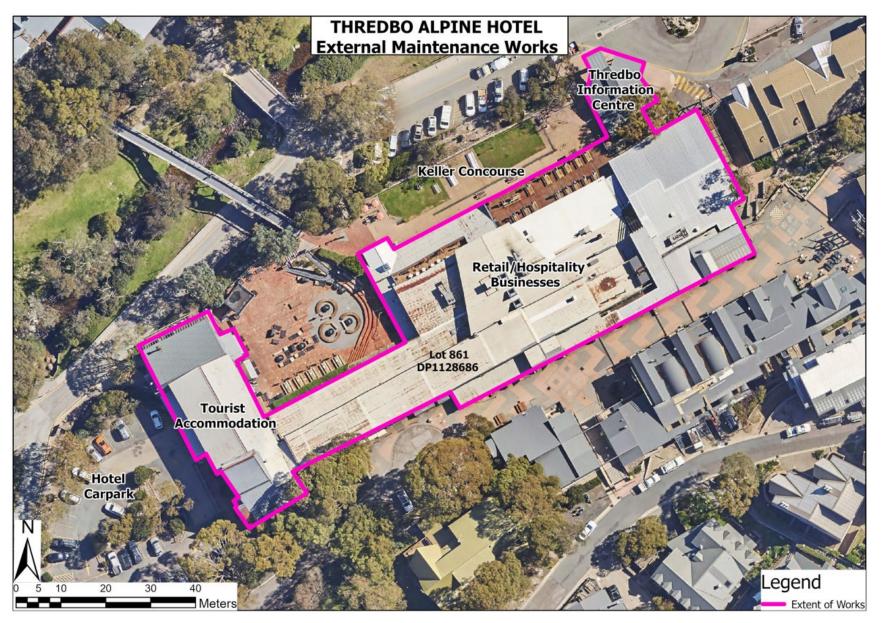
Whole of site plan showing planned location within the site of the proposed works
